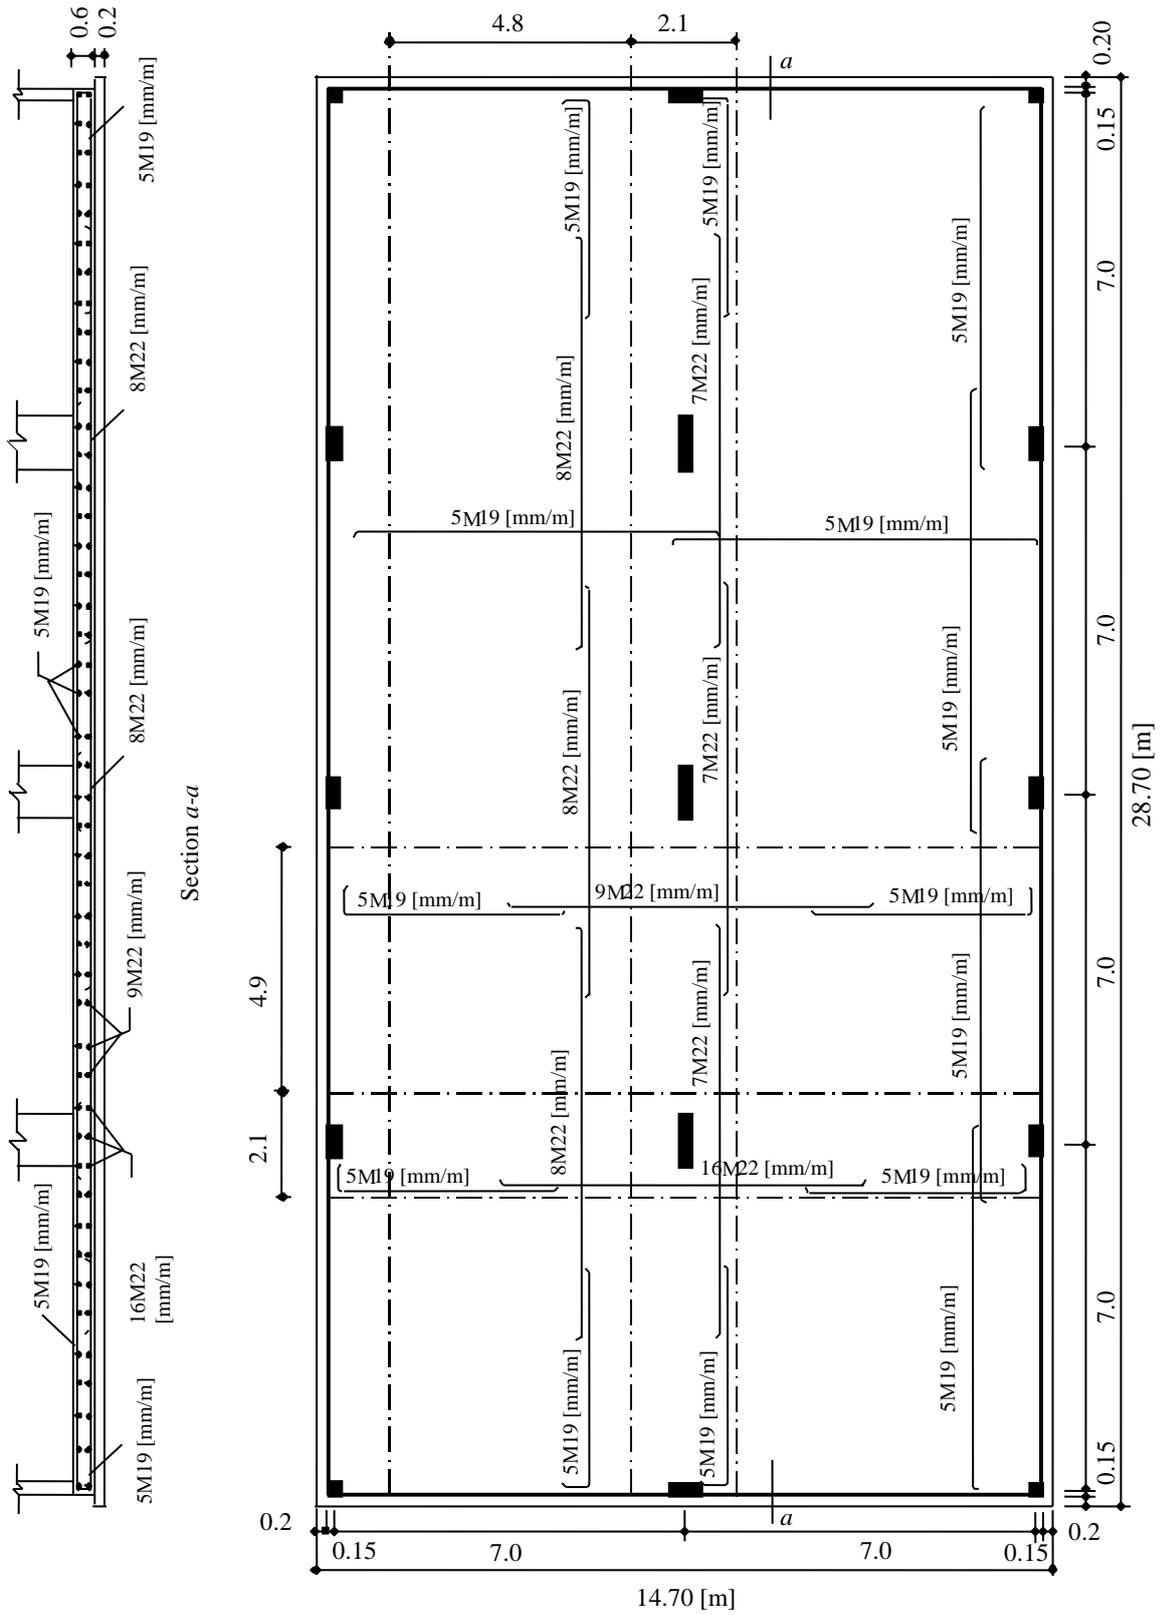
Details of reinforcement in plan and section *a-a* through the raft
